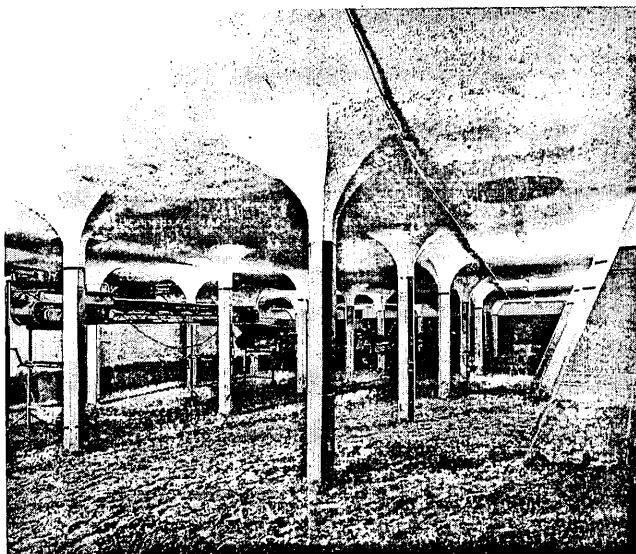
Hyperbolic flared capitals that connect columns to the roof slab of the filter building at Rorschach.
